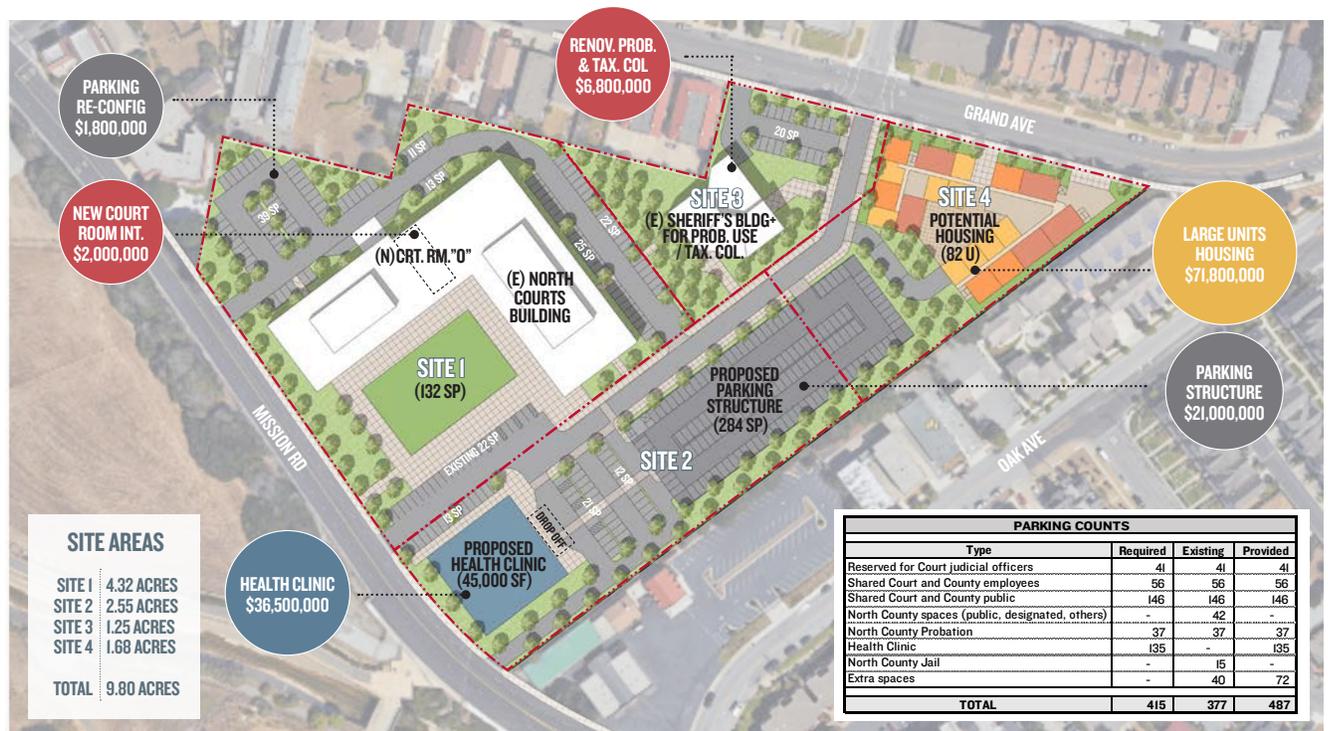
Option 4. Retain North County Jail / Mission Road Clinic Location
